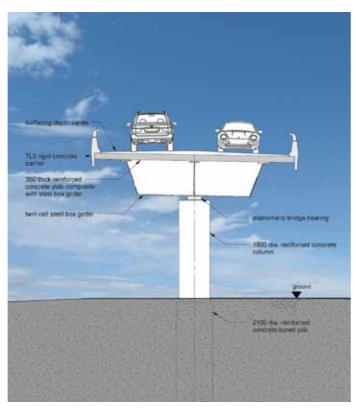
Bridge 25 Linden Fly-over cross-section
